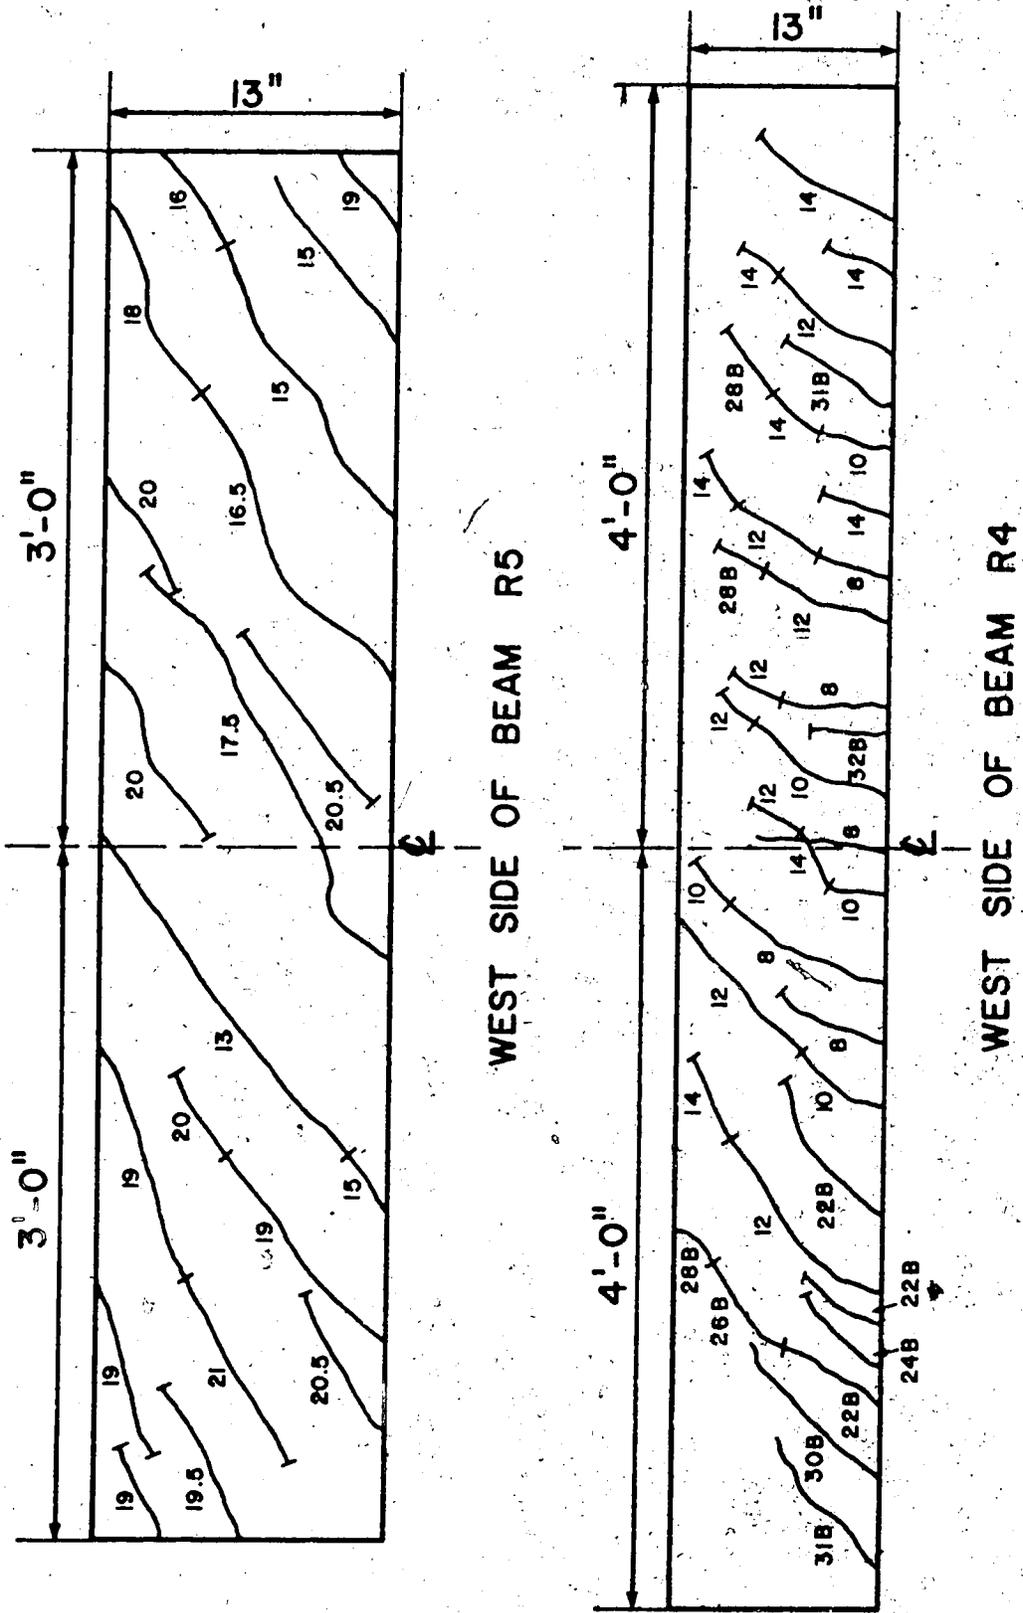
CRACKING PATTERNS FOR BEAMS R4 AND R5
